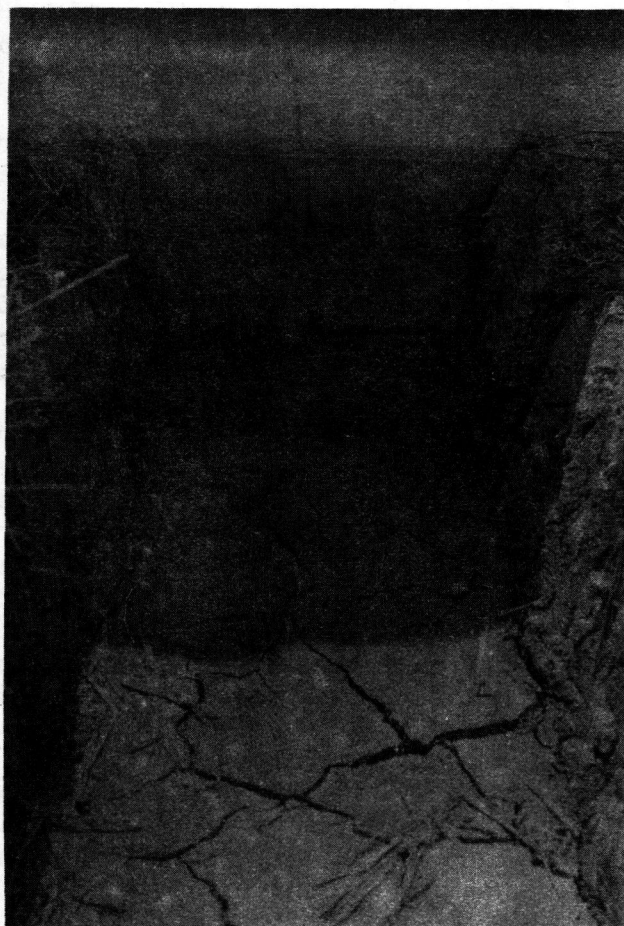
TRENCH CUT THROUGH BERM FROM PAVEMENT EDGE. WATER RAN FROM BENEATH THE PAVEMENT JOINT WHEN TRENCH WAS OPENED.
